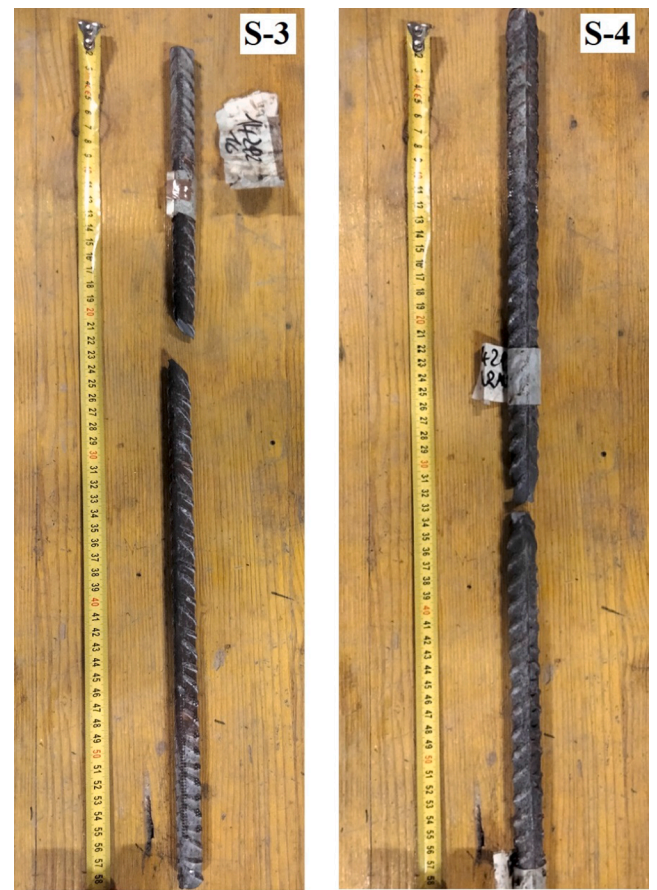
Reinforcement samples S-3 and S-4 after axial tensile failure.
